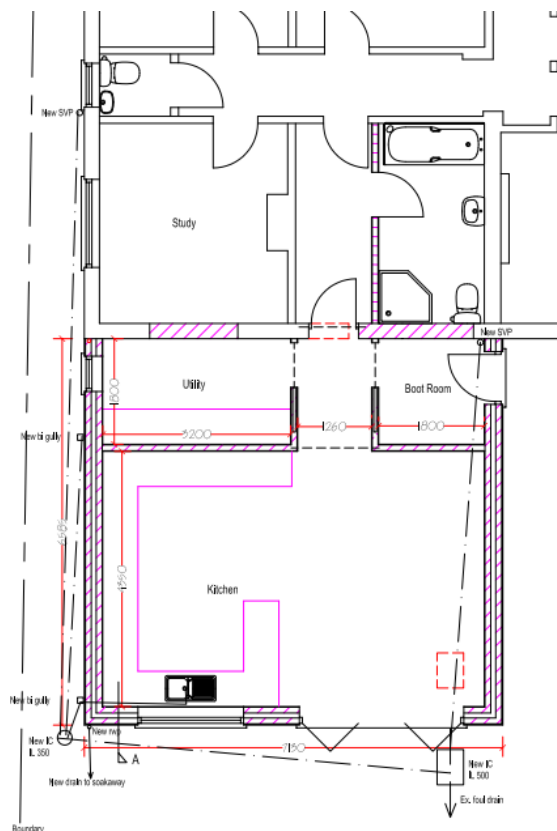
Fig B: Proposed Floor Plan - snippet (4/01366/15/FHA - Thistledo)
